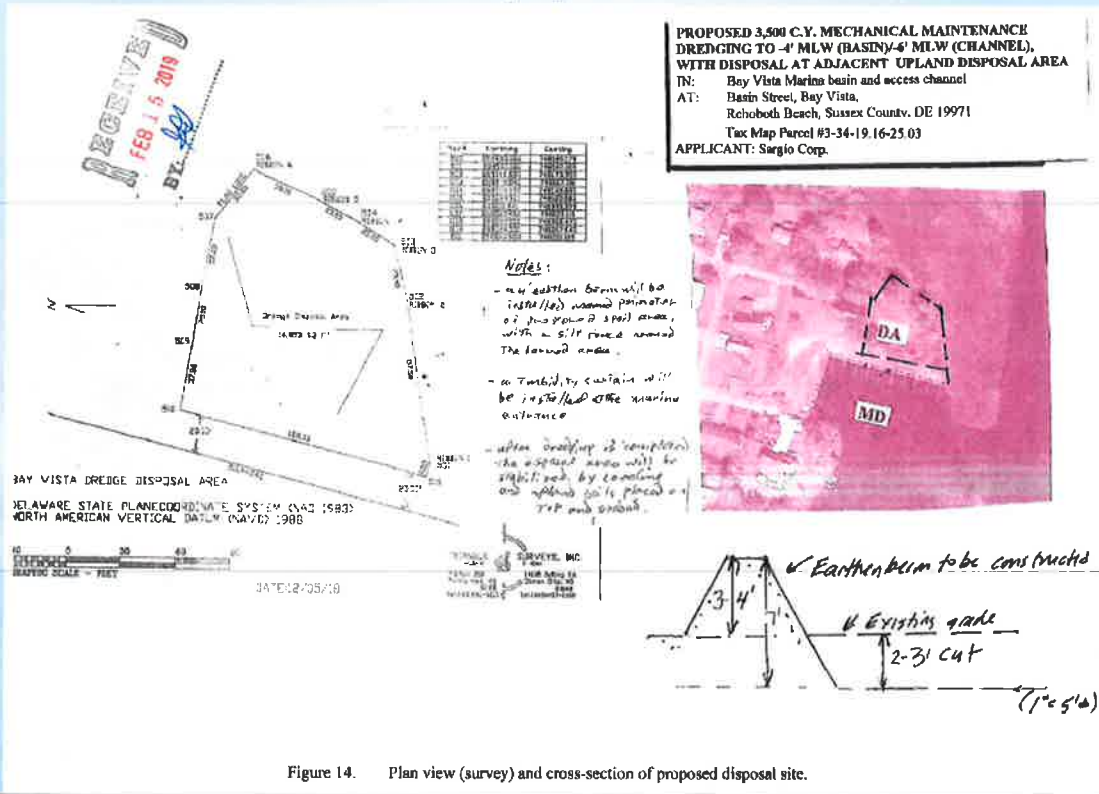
Plan view (survey) and cross-section of proposed disposal site.
